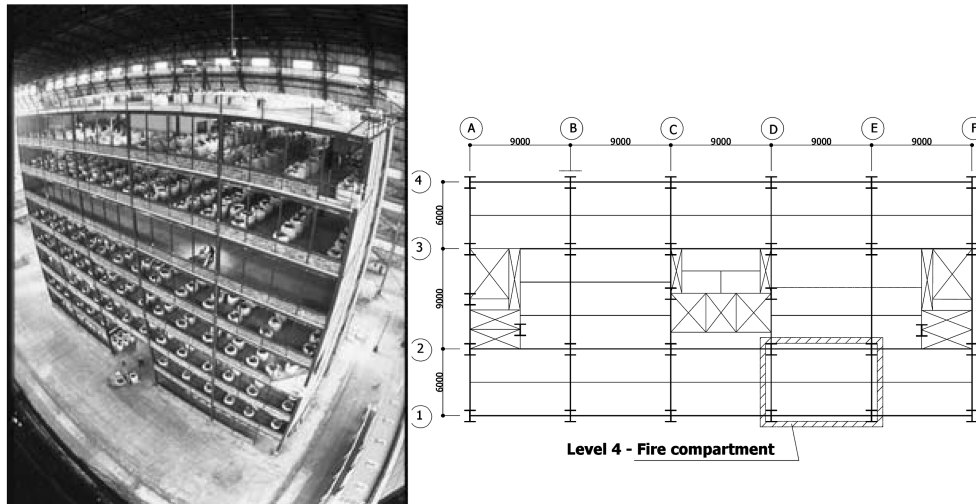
Cardington fire test: a) The eight storey steel structure; b) The fire compartment (Wald *et al.* 2005)
